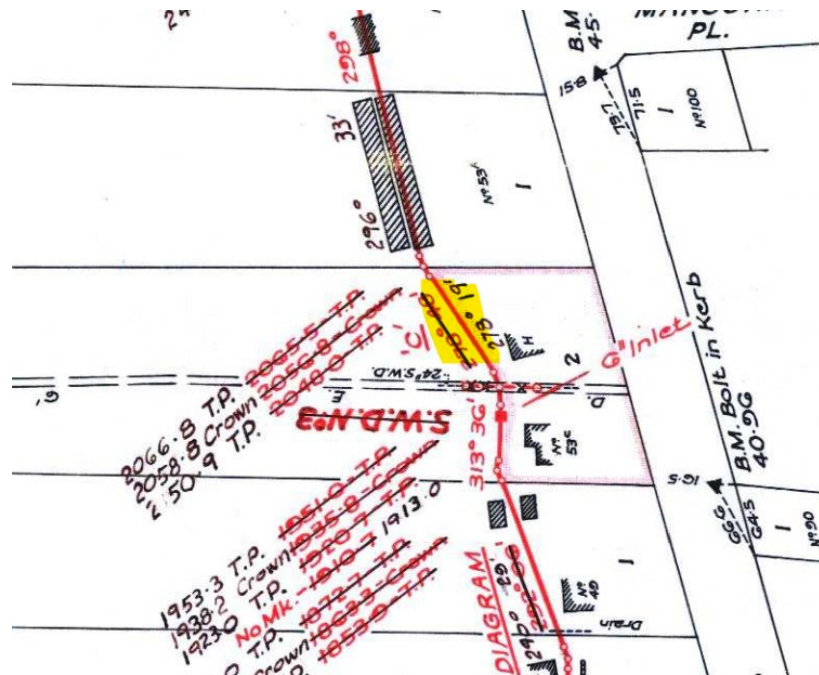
Excerpt of works as executed plan obtained from Northern Beaches Council which demonstrates the existence of the sewer easement. The location of the easement over the subject site has been highlighted in yellow.
